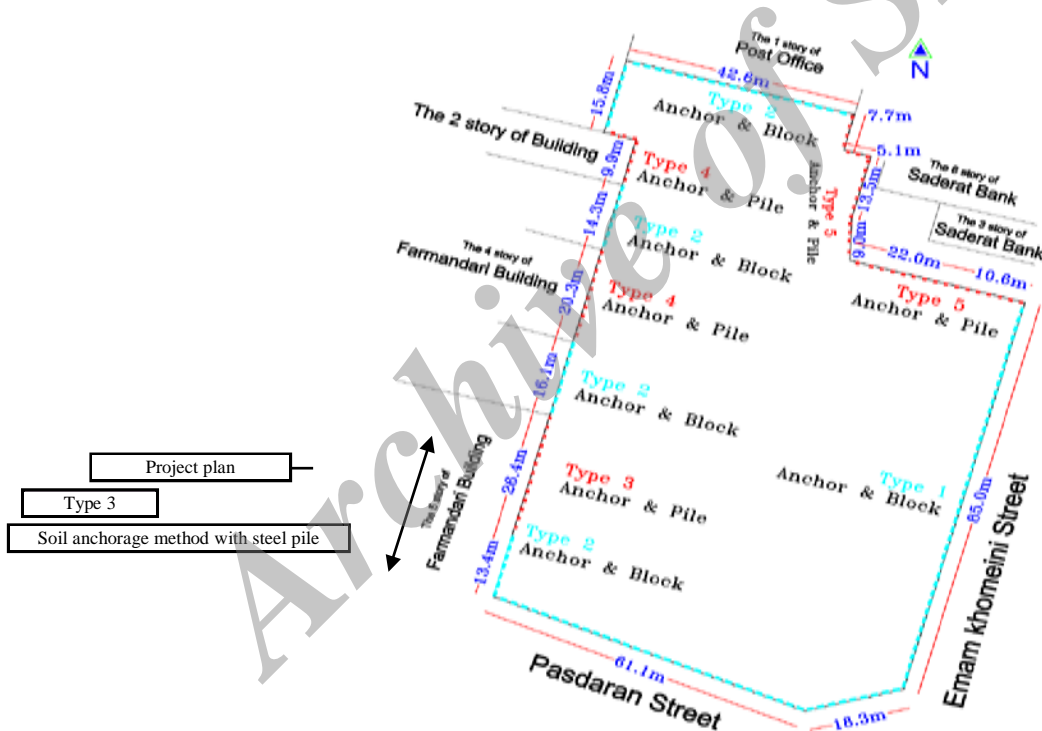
Project plan, surrounding surcharges and types of retaining structure
